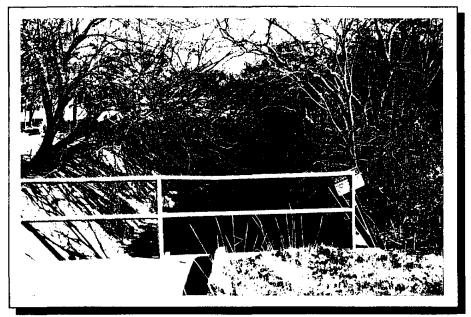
Upper PEC-4 Downstream of Wainwright Street
